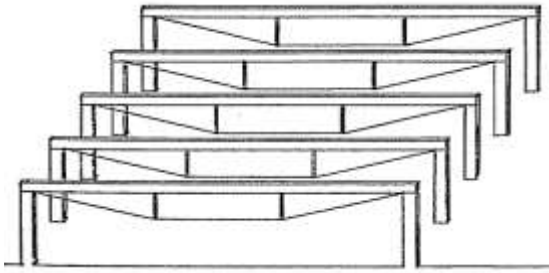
Cable Supported beam: Superposition of SECTION active and FORM Active Structural systems
